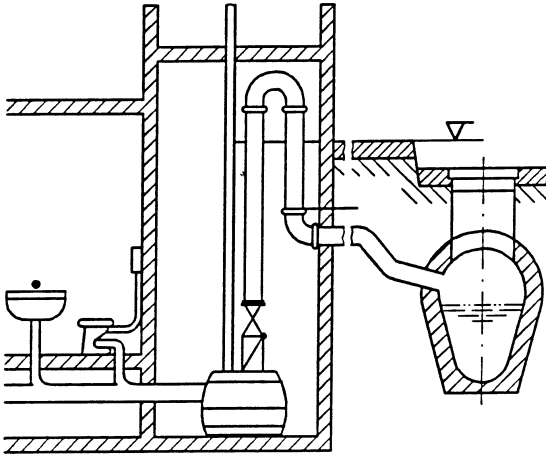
Illustration of protection against backflow where the drain or sewer is higher than the sanitary appliances
